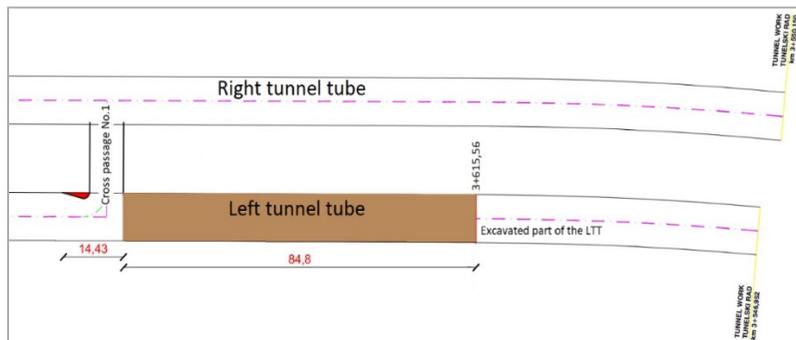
Situation view of the excavation of the left tunnel tube from the cross passage no. 1 to km. 3+615,56
